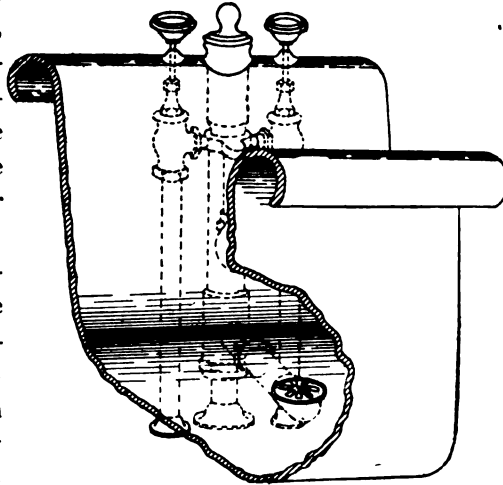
Showing Central Location of Fittings and Waste Outlet in Roman Bathtub.
